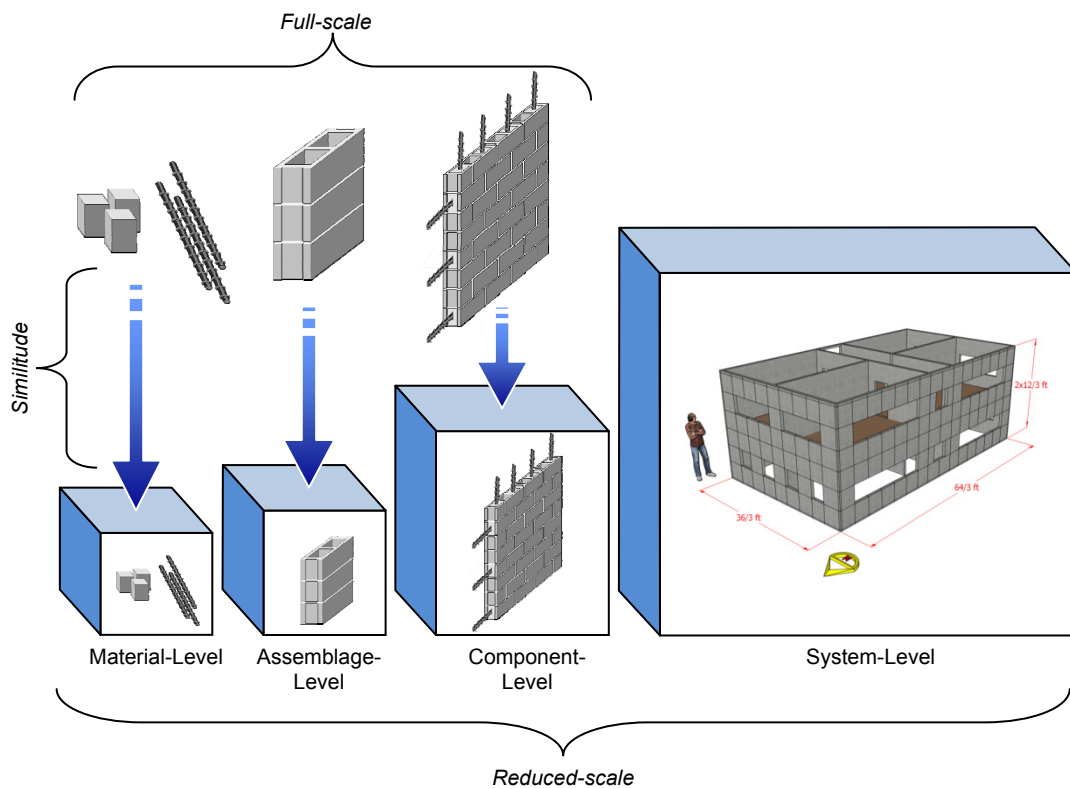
Overview of small-scale validation at the material-, assemblage-, and component-levels building to reduced scale experiments of complete masonry bearing-wall systems.
